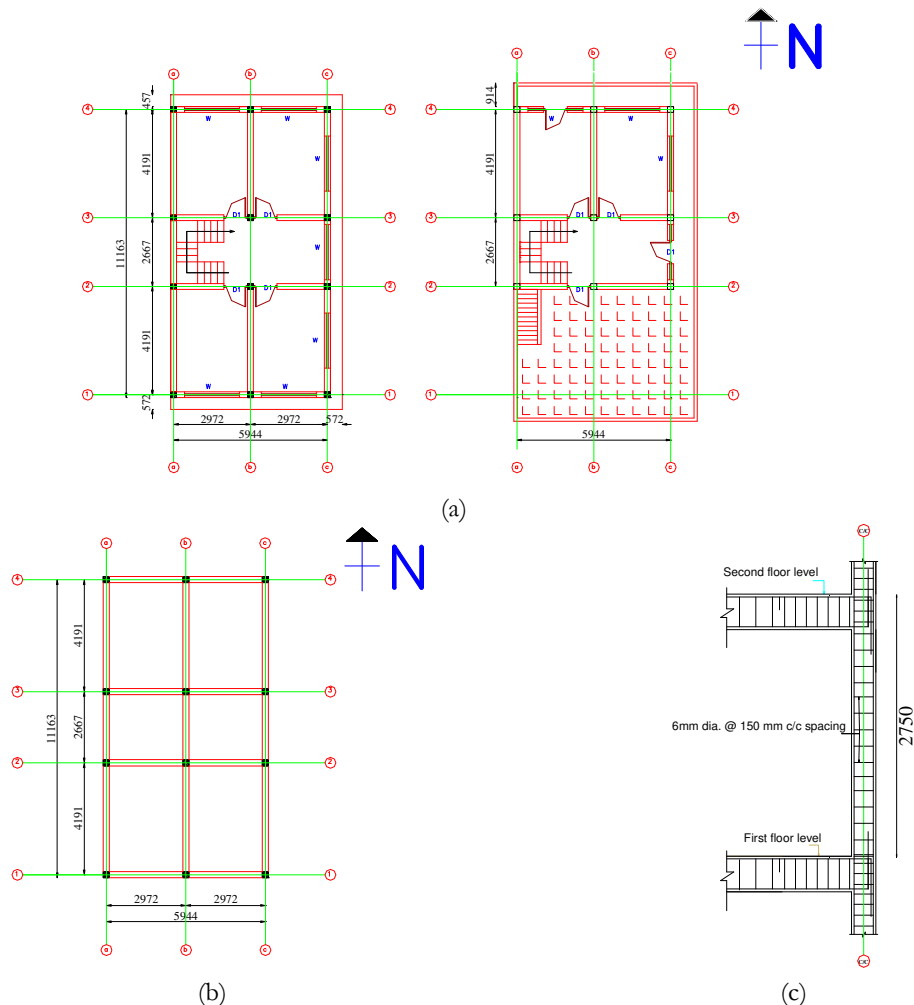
Geometrical layout and structural details of the CCP2 building; (a) Typical first and roof floor plans, (b) Column and beam layout and (c) Representative detailing of stirrups in column (all dimensions are in mm)
